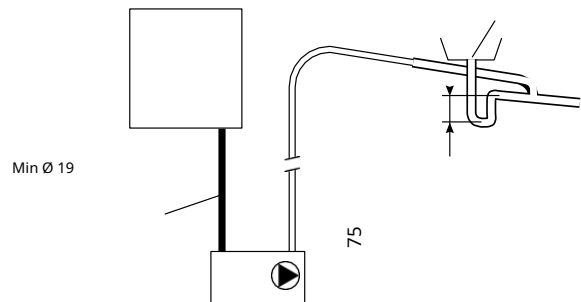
Typical connection method of a condensation water drainage pipe (detailed instructions from the pump manufacturer)
